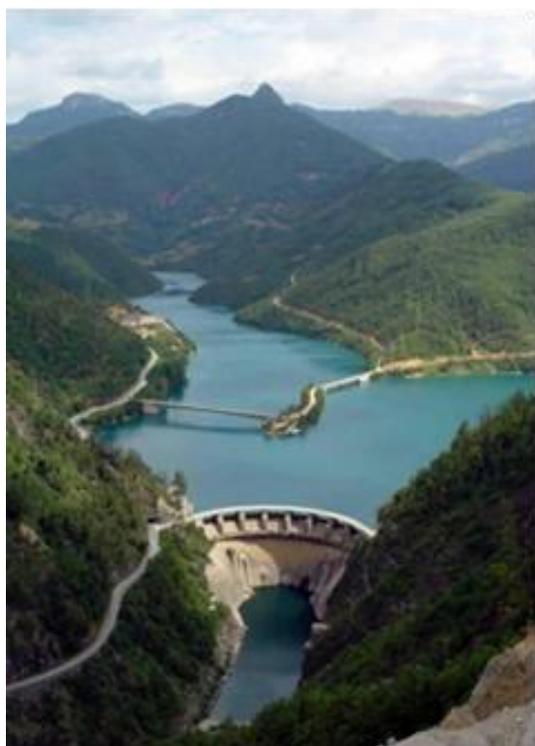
The Hydro Power Plant „Jablanica“, constructed in 1955.
